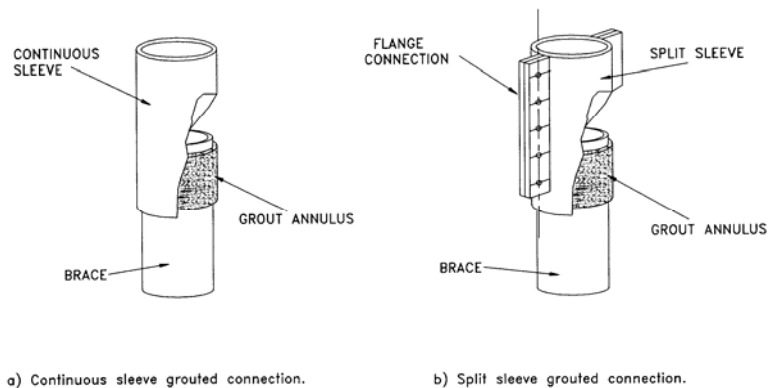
Examples of typical unstressed grouted sleeve connections
